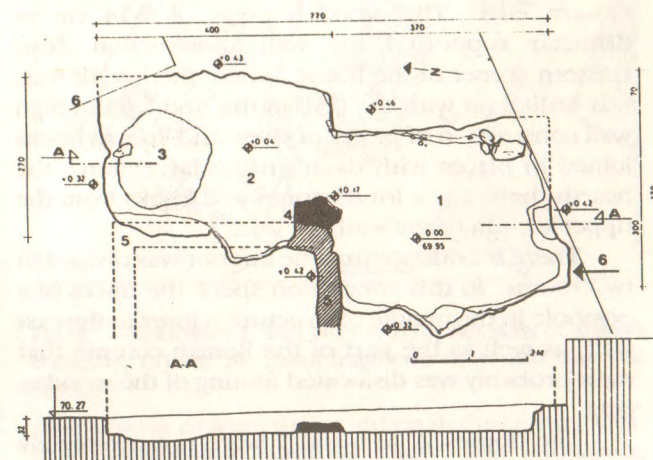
House 12, plan and section: 1-2) Rooms; 3) Pit; 4) Oven; 5) Remains of the Roman wall; 6) Entrance.
